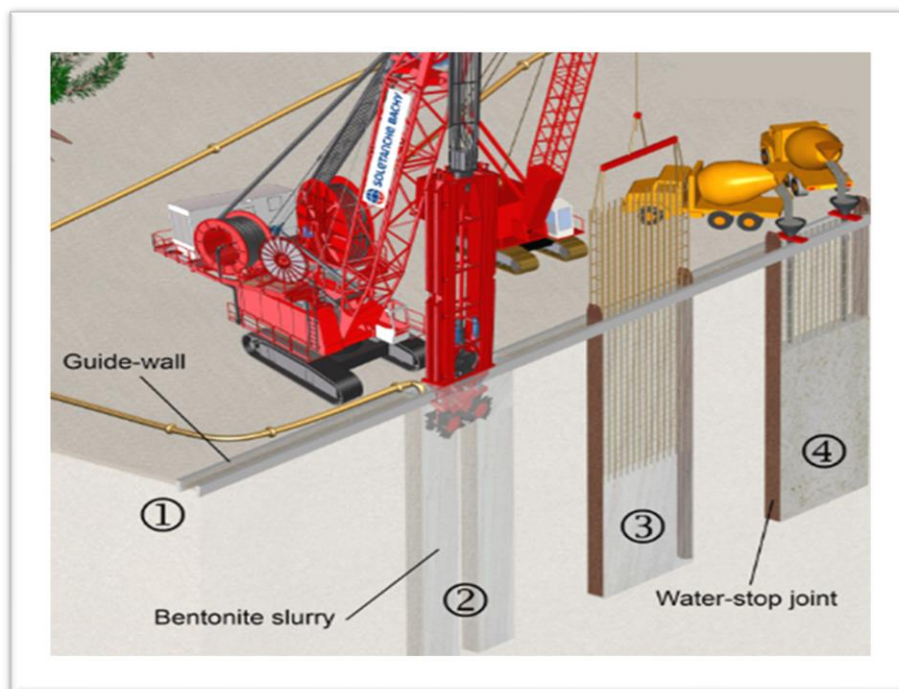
Construction process of a diaphragm wall (Keller, 2005)
